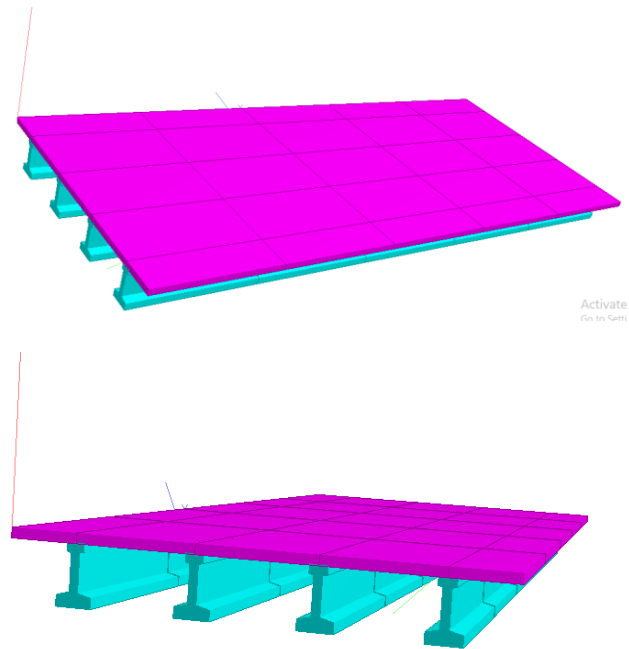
3D Modelled bridge deck using STAAD.Pro
